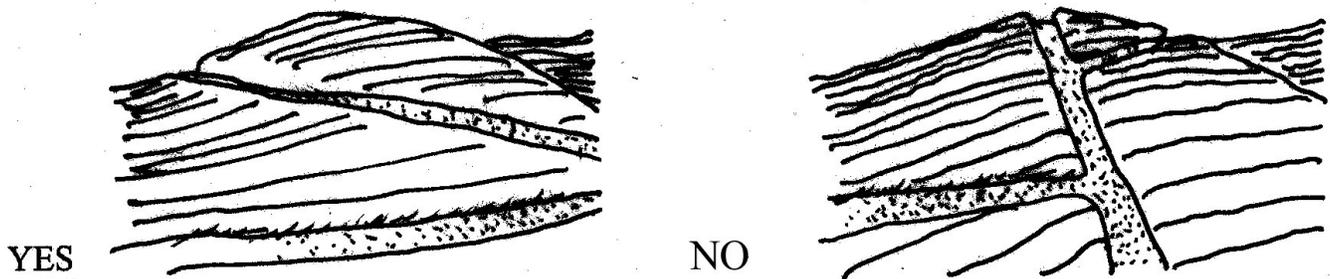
New roads in open fields should curve with the land, not cross hilltops or follow ridges.
